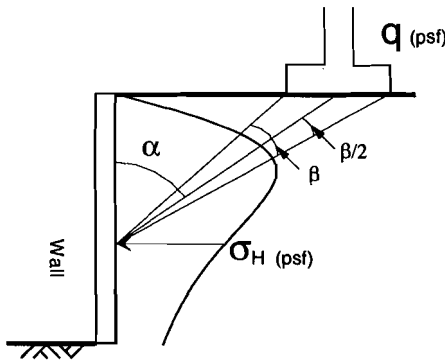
Surcharge loading for yielding walls (not drawn to scale, USN 1986)
